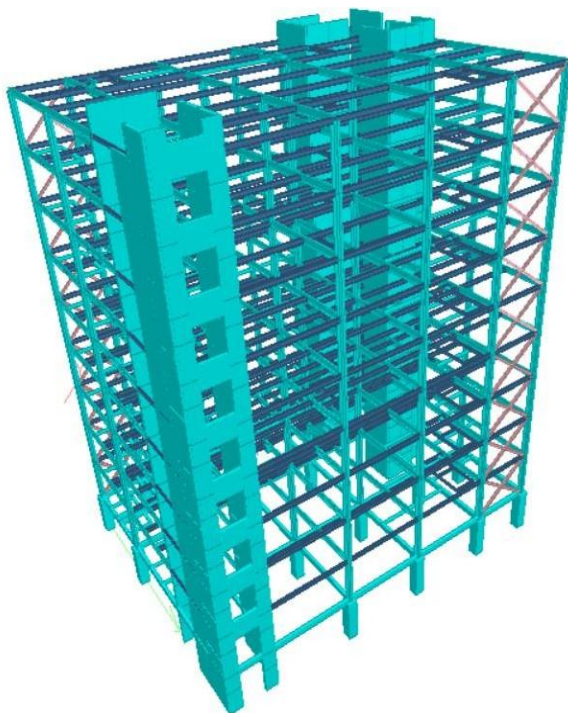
3-D Rendered View in STAAD. PRO
